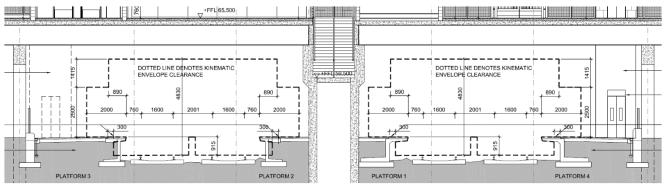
Typical platform arrangement at Clondalkin / Fonthill station
